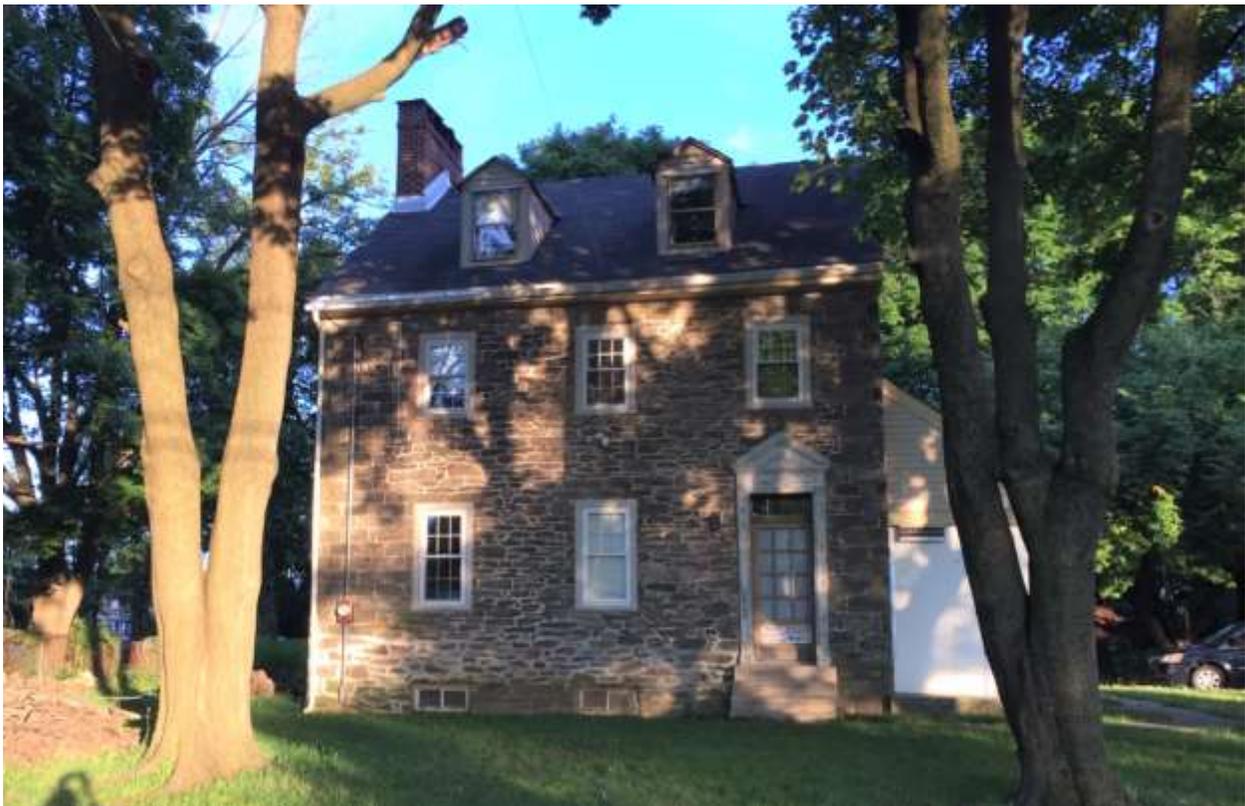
Front elevation, July 2022, David Nepley. Note the original plank frames supporting the window openings. Replacement windows replicate what is likely the original six-over-six divided-lite configuration.
